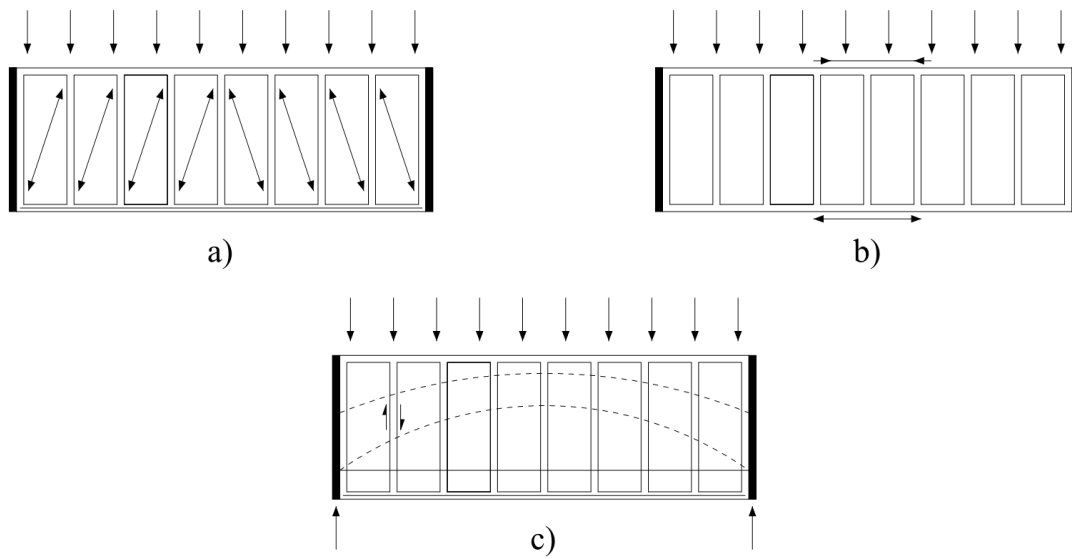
Structural models showing the transfer of forces in diaphragms modelled as a) a truss, b) a girder, and c) a deep beam. Redrawn from Fib (2000).
